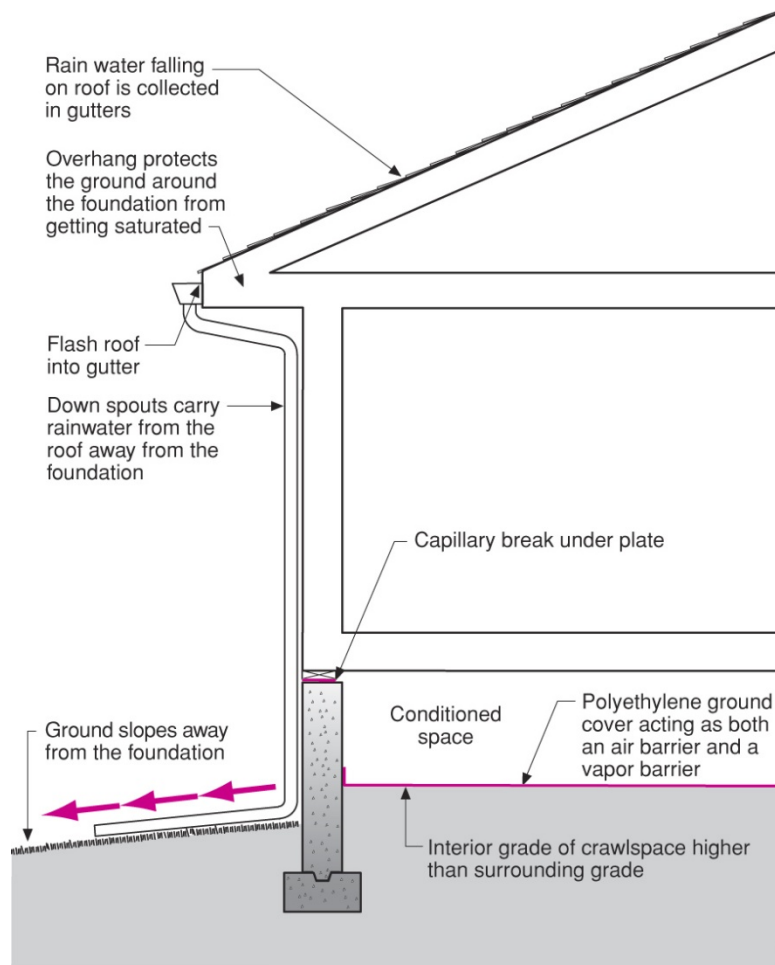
Conventional crawlspace section drawing where interior grade is higher than exterior grade
